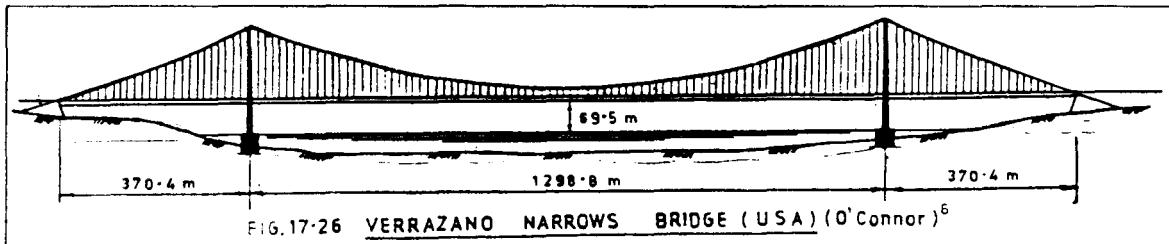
VERRAZANO NARROWS BRIDGE (U.S.A.) (O'Connor)<sup>6</sup>
